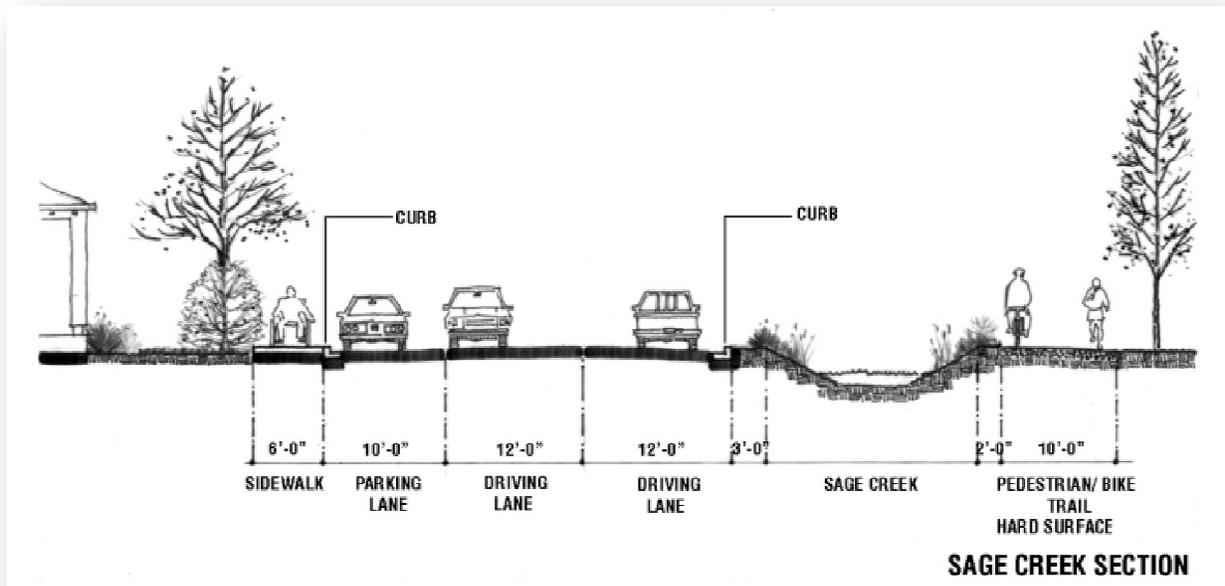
Washakie Avenue - Sage Creek Section from Canal looking East, Worland Area Trails Master Plan
